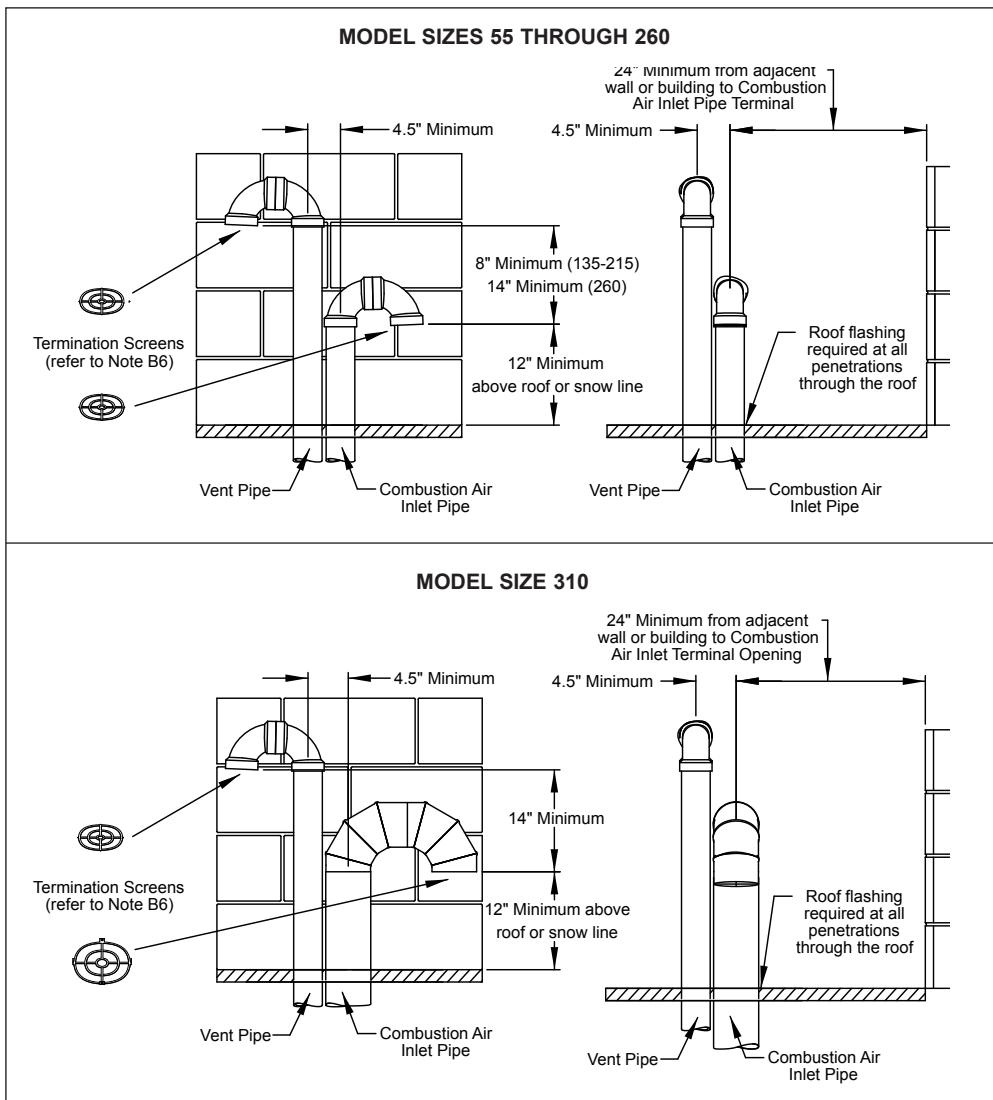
Vertical 2-Pipe Vent System for Sloped Roofs
